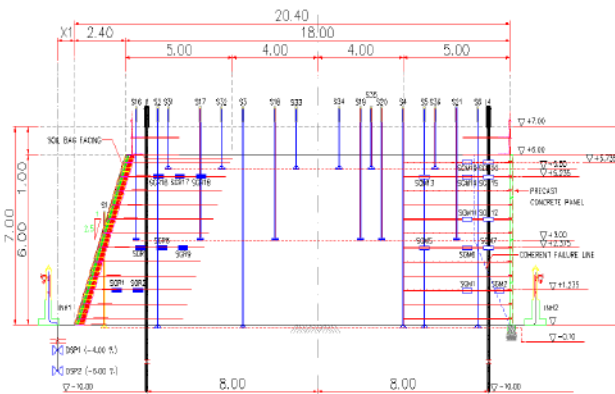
Cross section of MSE wall/embankment indicating the locations of monitoring instruments
